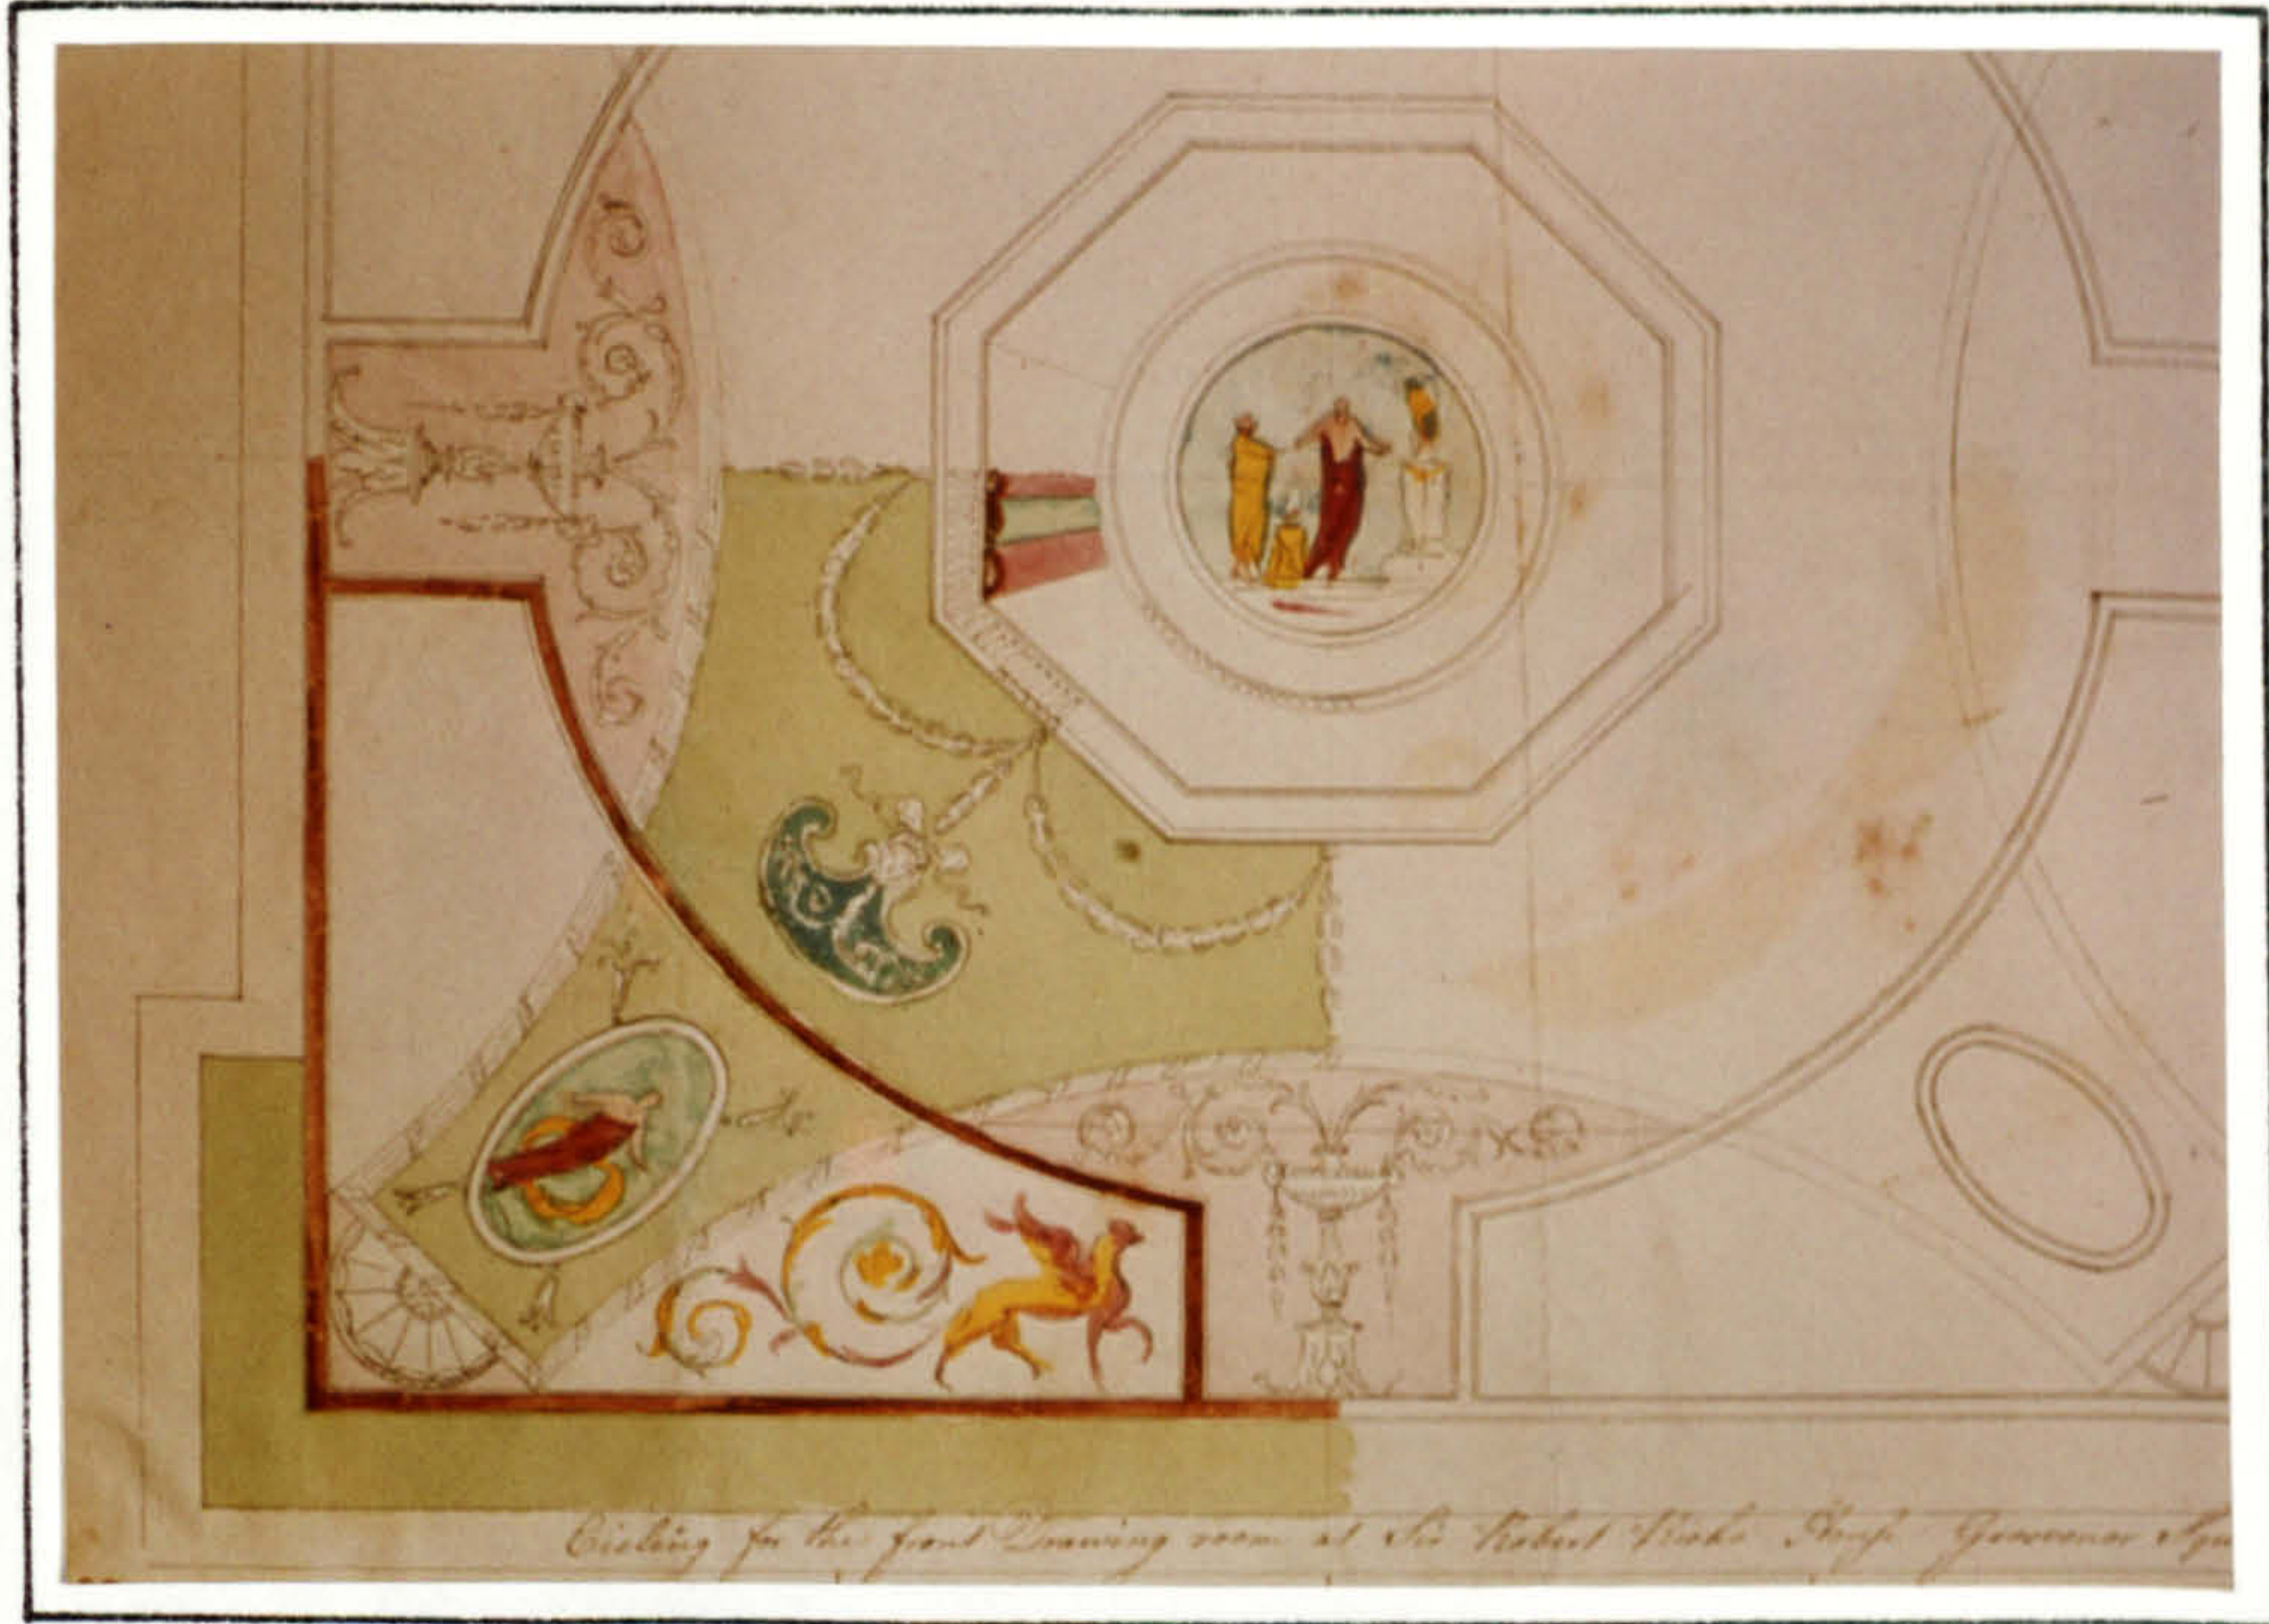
ROBERT ADAM · CEILING FOR FRONT DRAWING ROOM IN SIR ROBERT RICH'S HOUSE · GROSVENOR SQUARE · 1769
